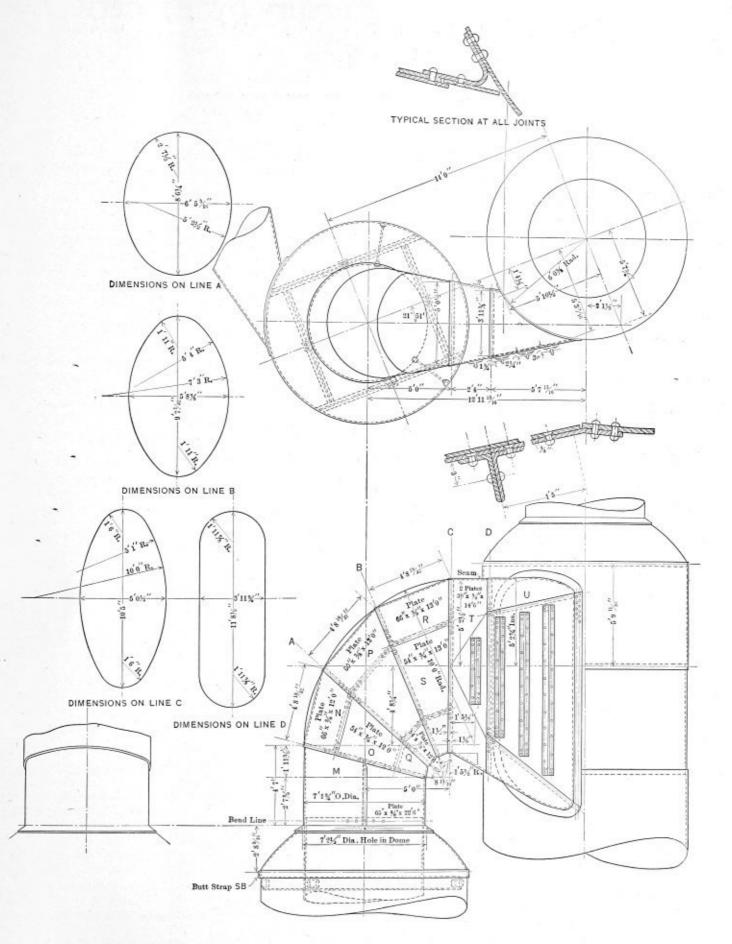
Elbow and Connection Leading Out of Side of Stack-Short Radius
